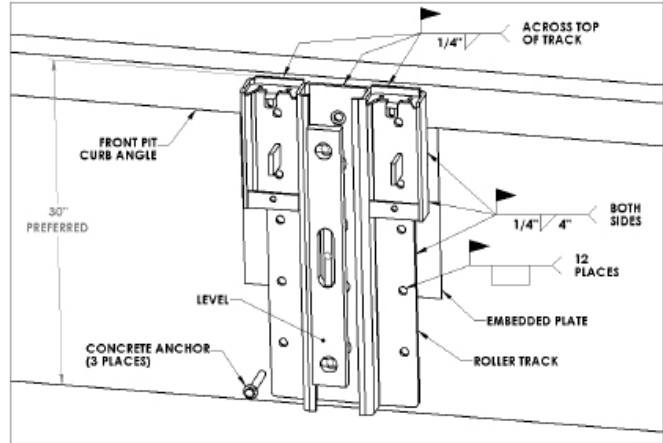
FIGURE C—WELDING ROLLER TRACK FRONT VIEW (WITH EMBEDDED PLATE)
